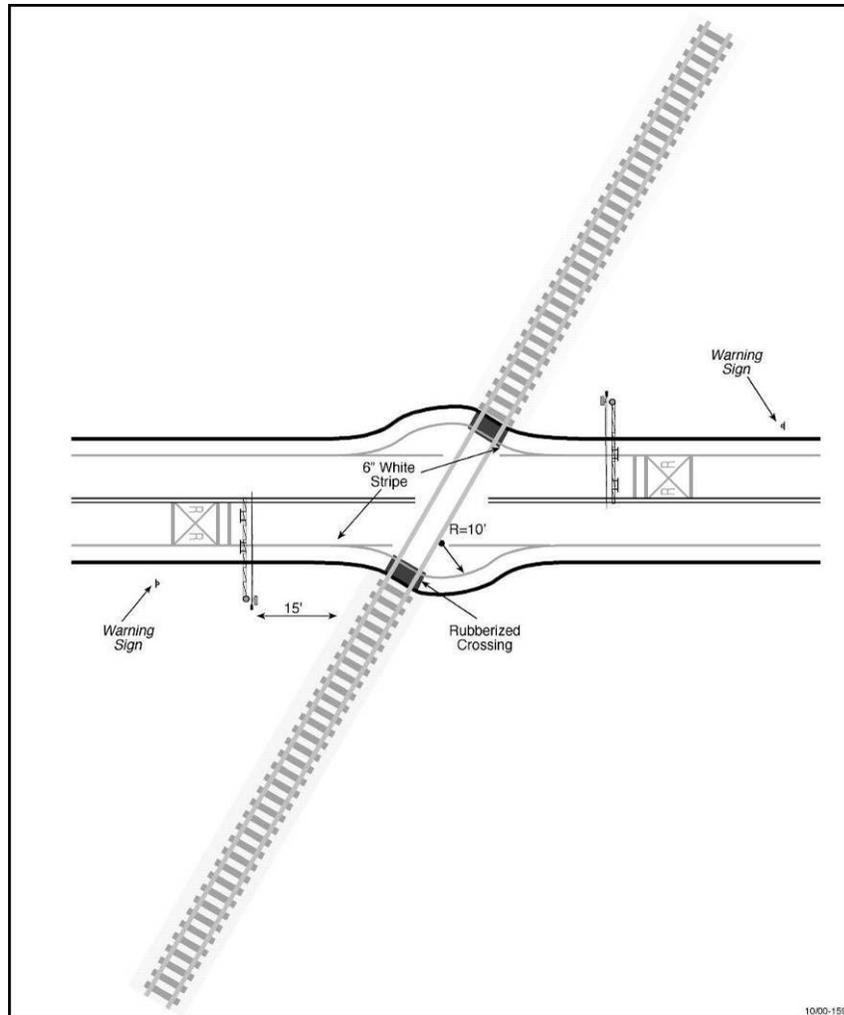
Bike Lanes Crossing at Railroad Tracks
